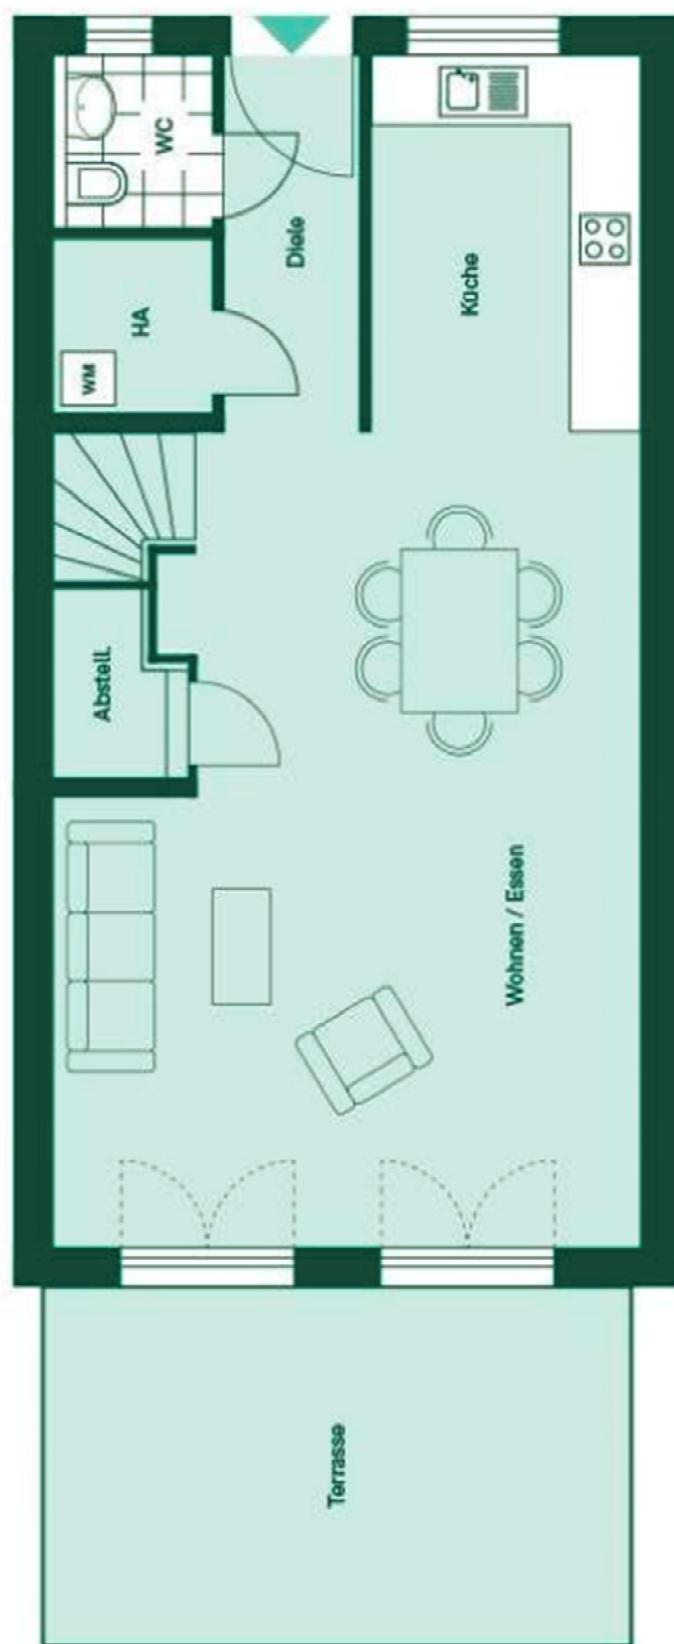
Terraced house, building location: Aachen, earthquake zone 2 [13]
